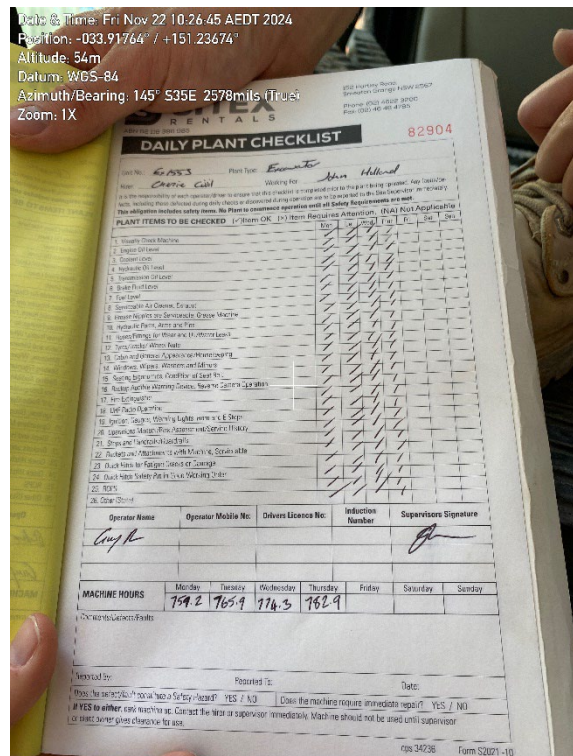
23T Excavator (EX1553) Sitex in-plant daily plant checklist log book.
